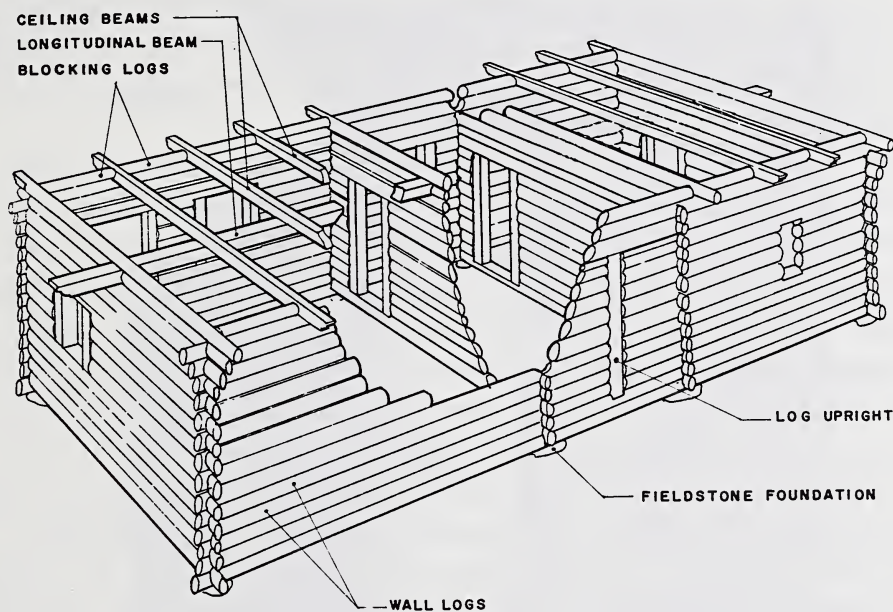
The original zrub (horizontal log wall) and svolok (ceiling beam) construction of the Grekul House looking south-west. Drawing by Gordon Menzies, March, 1984.
